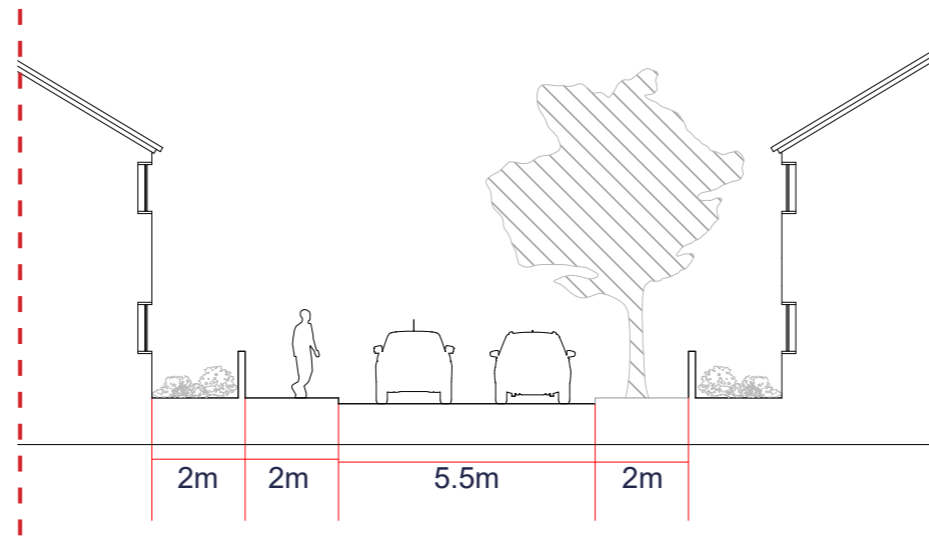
Type E Access Street section showing defensible space, pedestrian movement routes, vehicle carriageway and a verge with trees/planting. (Not to scale)
